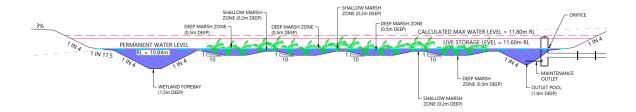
Wetland 2-1 Cross section A, DWG No. P24-447-01-3603-DR
